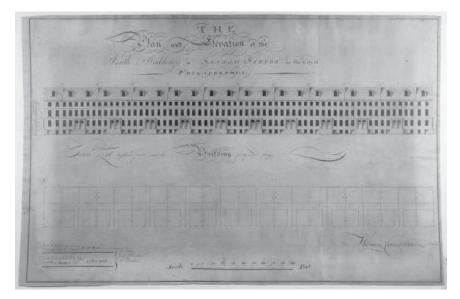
Front elevation and floor plan of William Sansom's row house project on Sansom Street, newly cut through Morris's original block. Thomas Carstairs, "The Plan and Elevation of the South Buildings in Sansom Street, in the city of Philadelphia," ca. 1800. Courtesy of the Library Company of Philadelphia.
